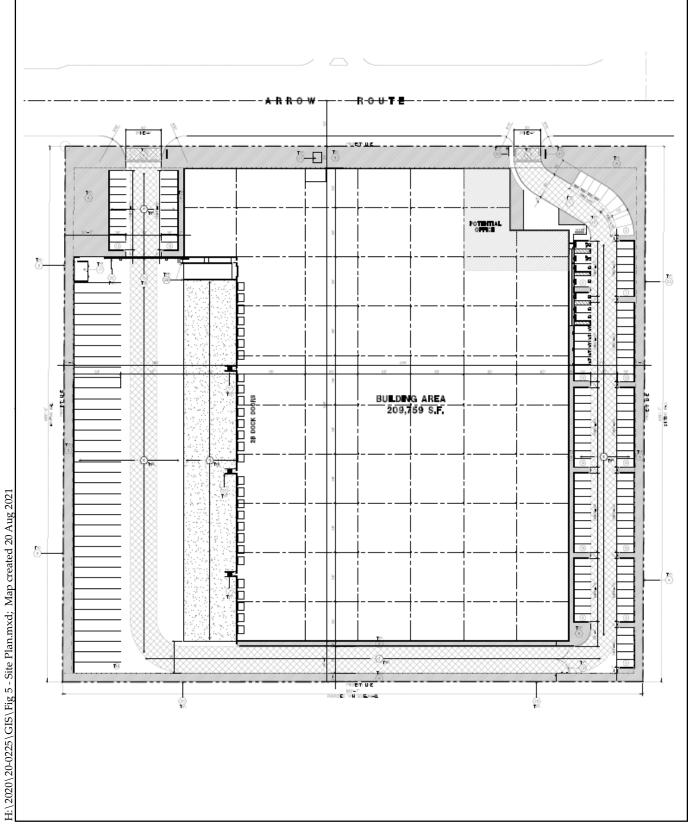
Site Plan 15719 and 15755 Arrow Route Warehouse
